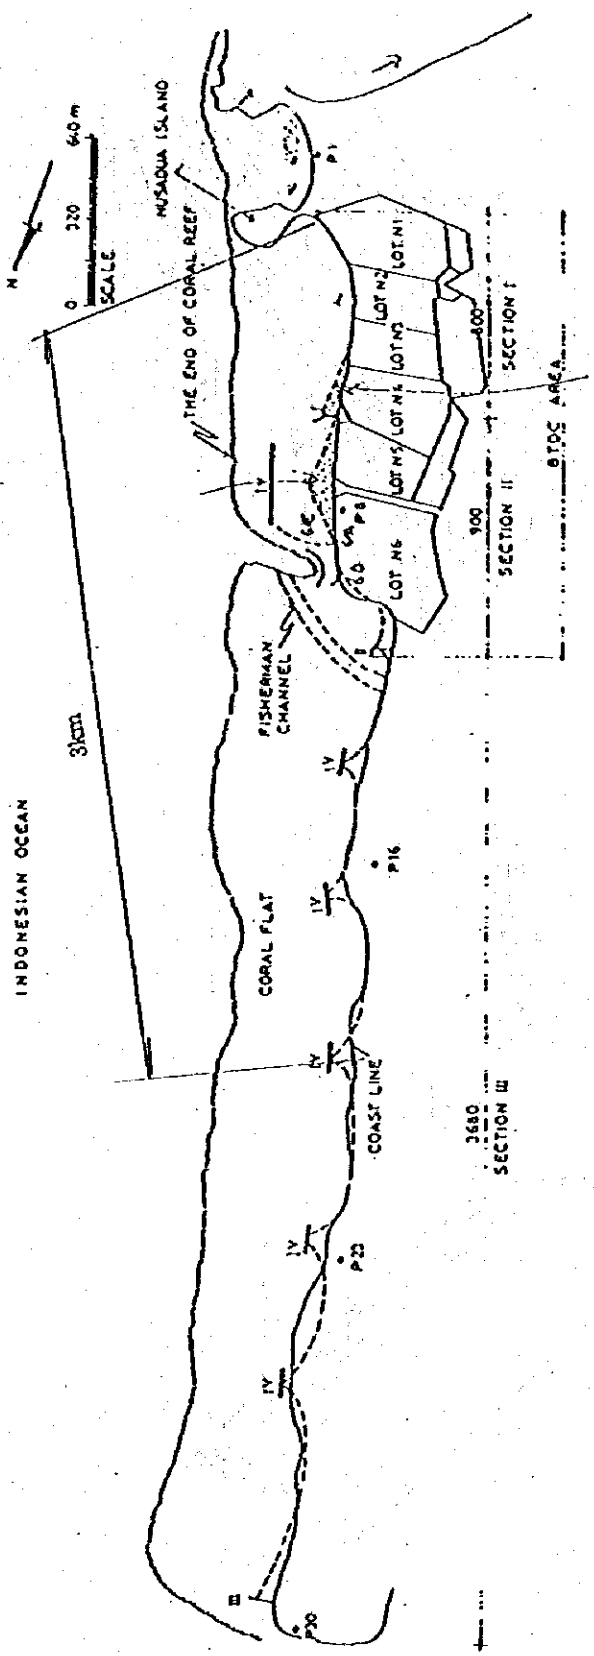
MASTER PLAN OF BEACH PROTECTION WORKS AT NUSA DUA AREA
